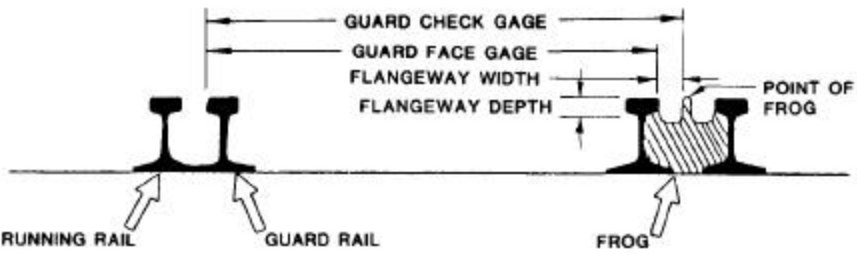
Measurement of flangeway width, flange- way depth, guard check gage, and guard face gage
